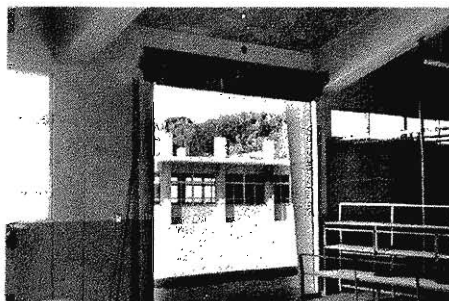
Damage to light-gauge steel shutter : complete removal of shutter from the opening.
